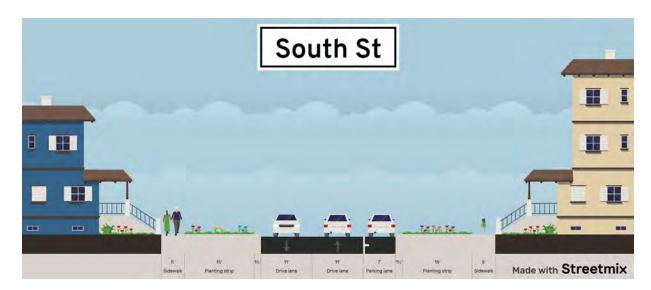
Proposed Cross Section for South Street from Michigan Avenue to Westnedge Avenue
